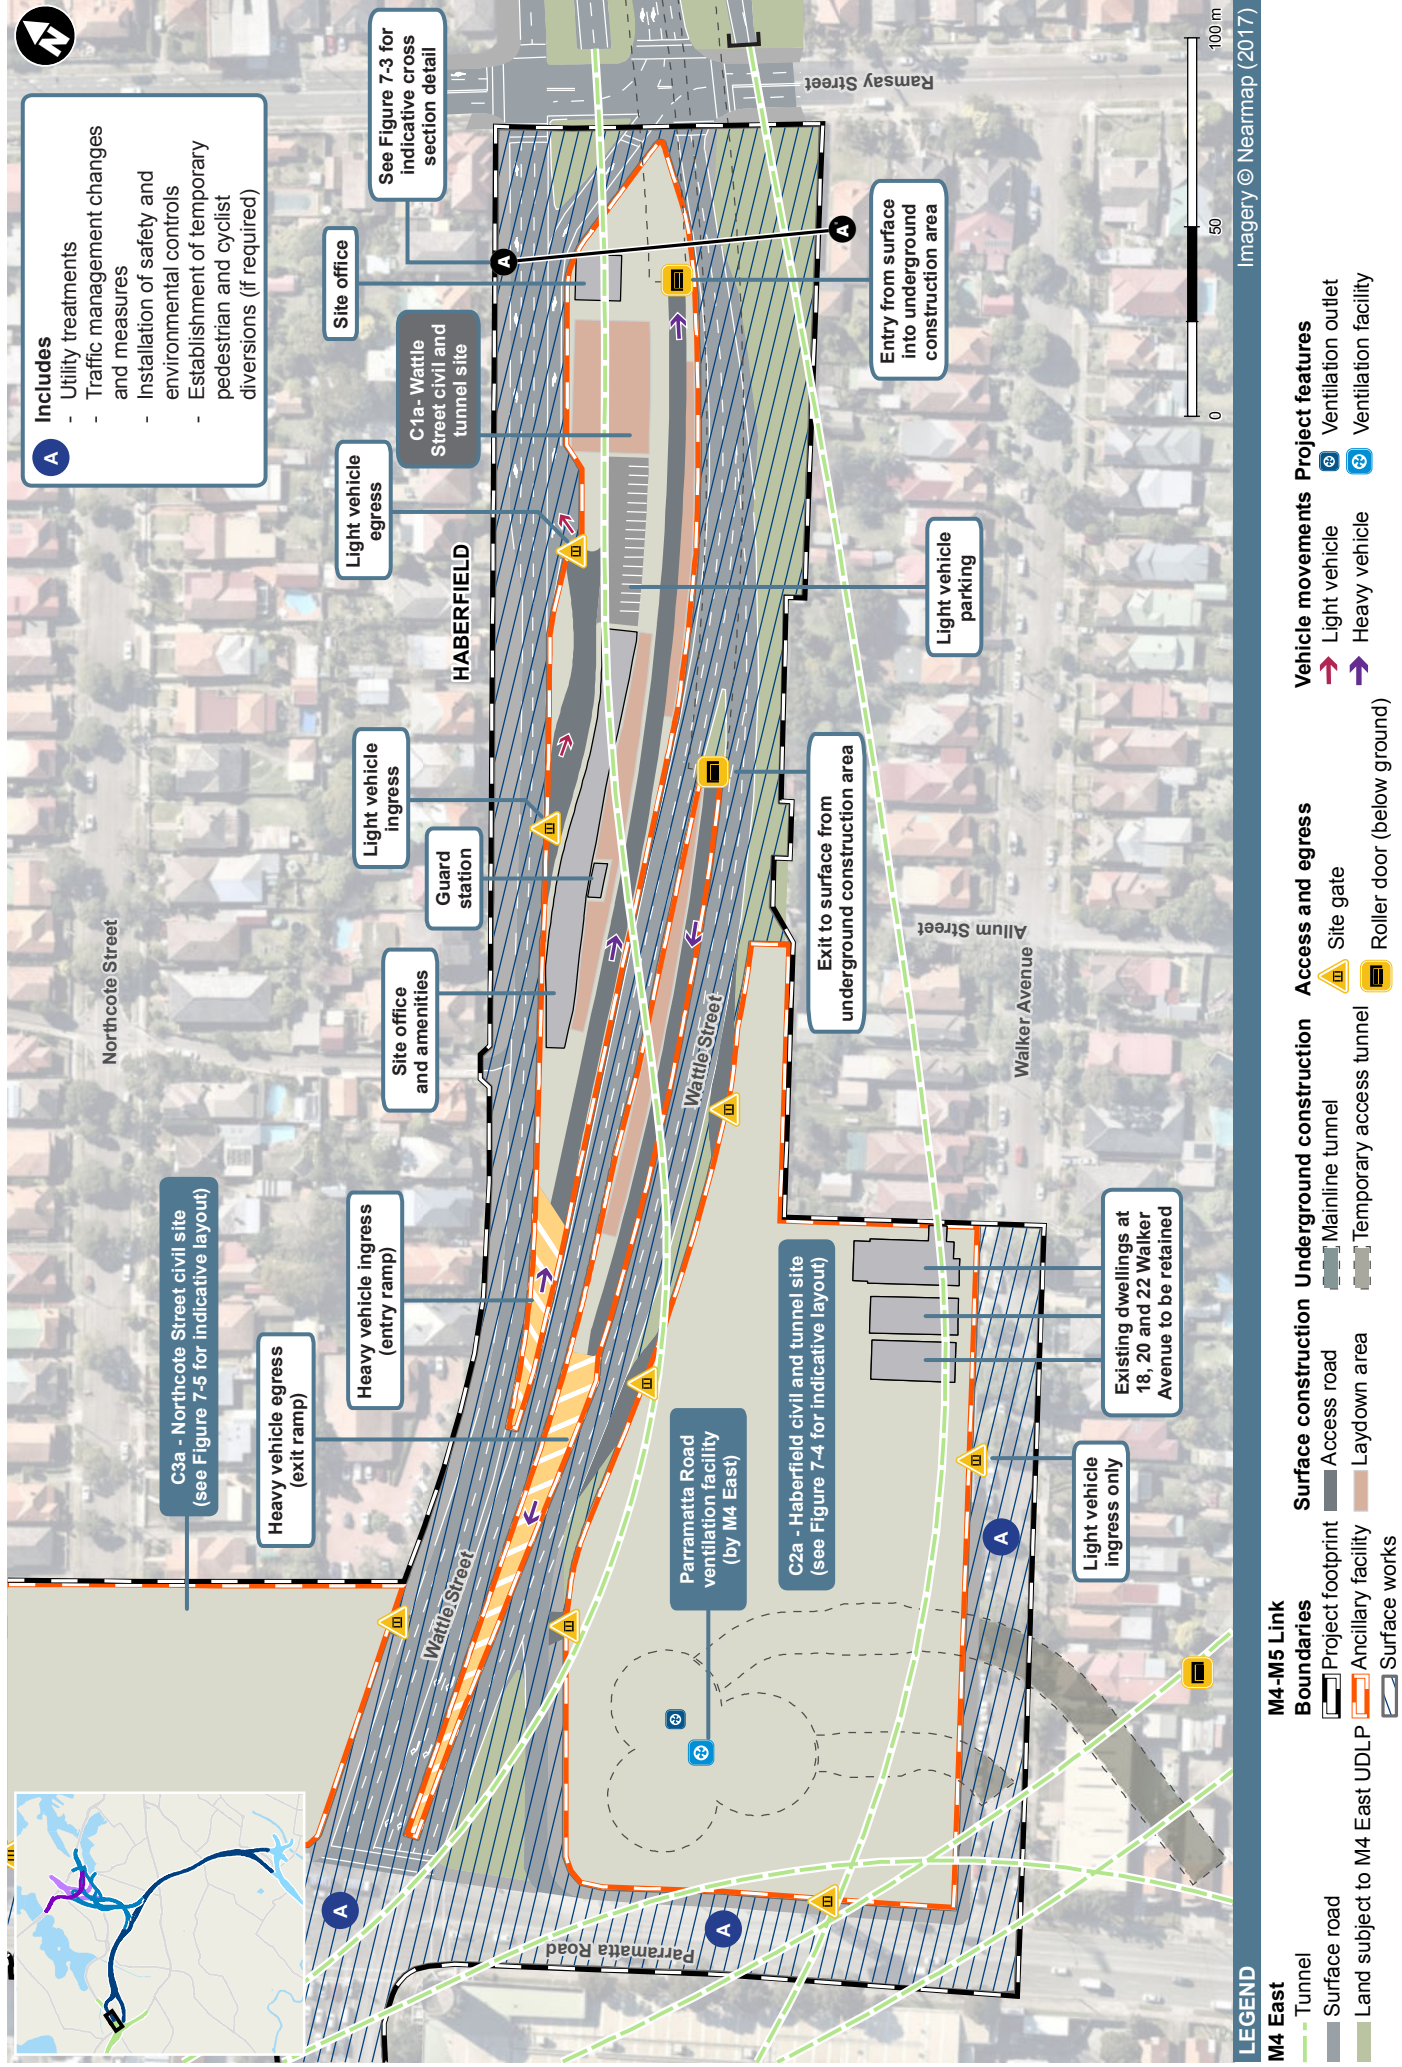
Indicative Wattle Street civil and tunnel site (C1a) layout
